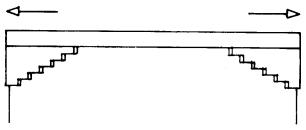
Tensile cracks in a wall due to restraint at the top of the wall.
